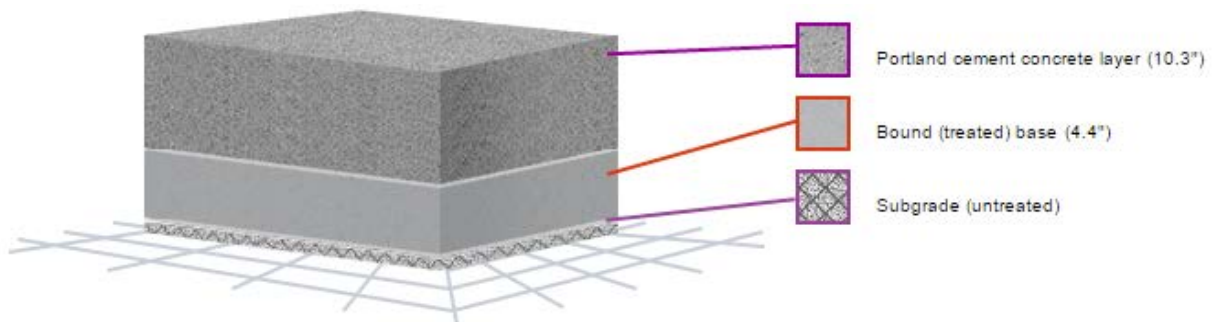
Pavement structure of LTPP Segment 40-4158
